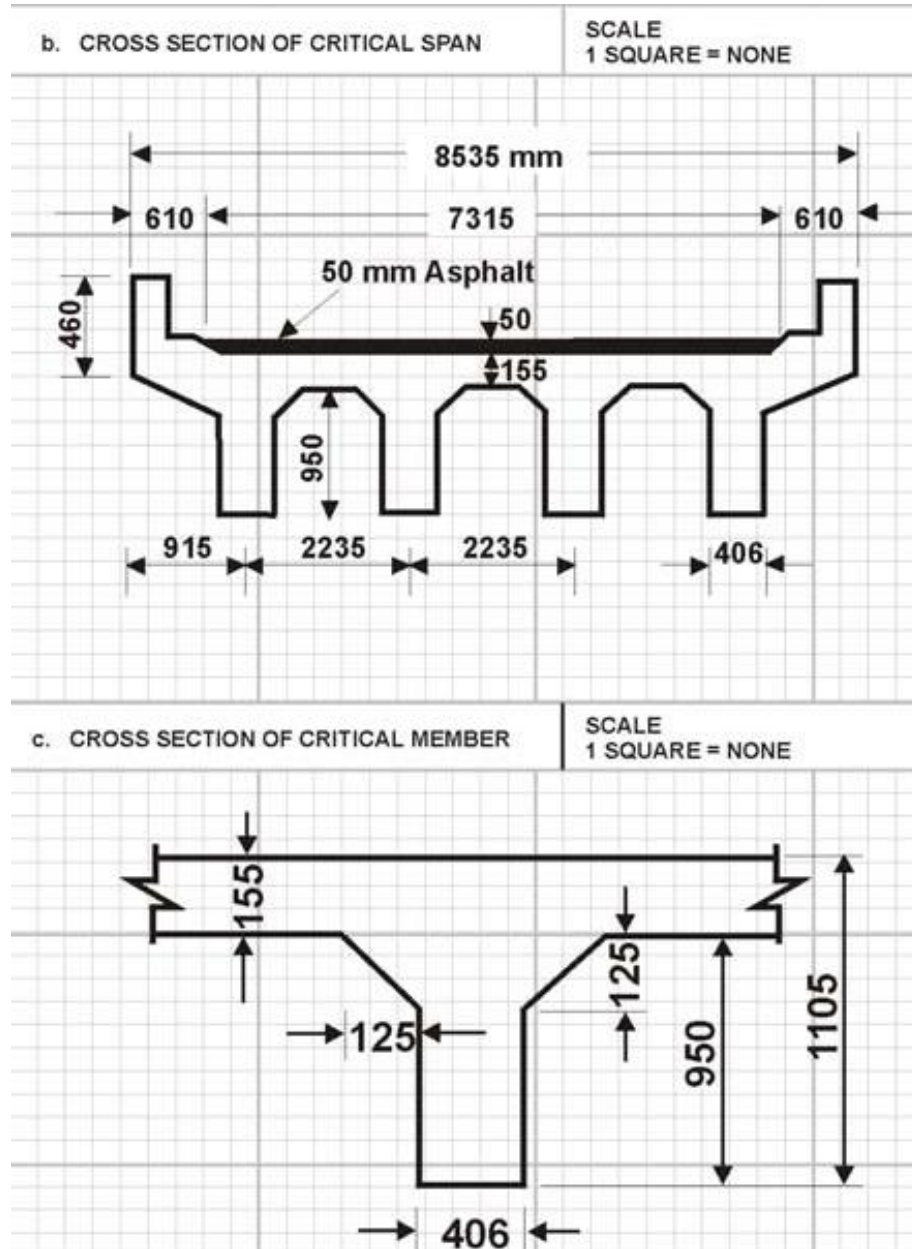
Cross section of bridge (DND, 2007a), 15.25 m concrete T-beam (x4)
